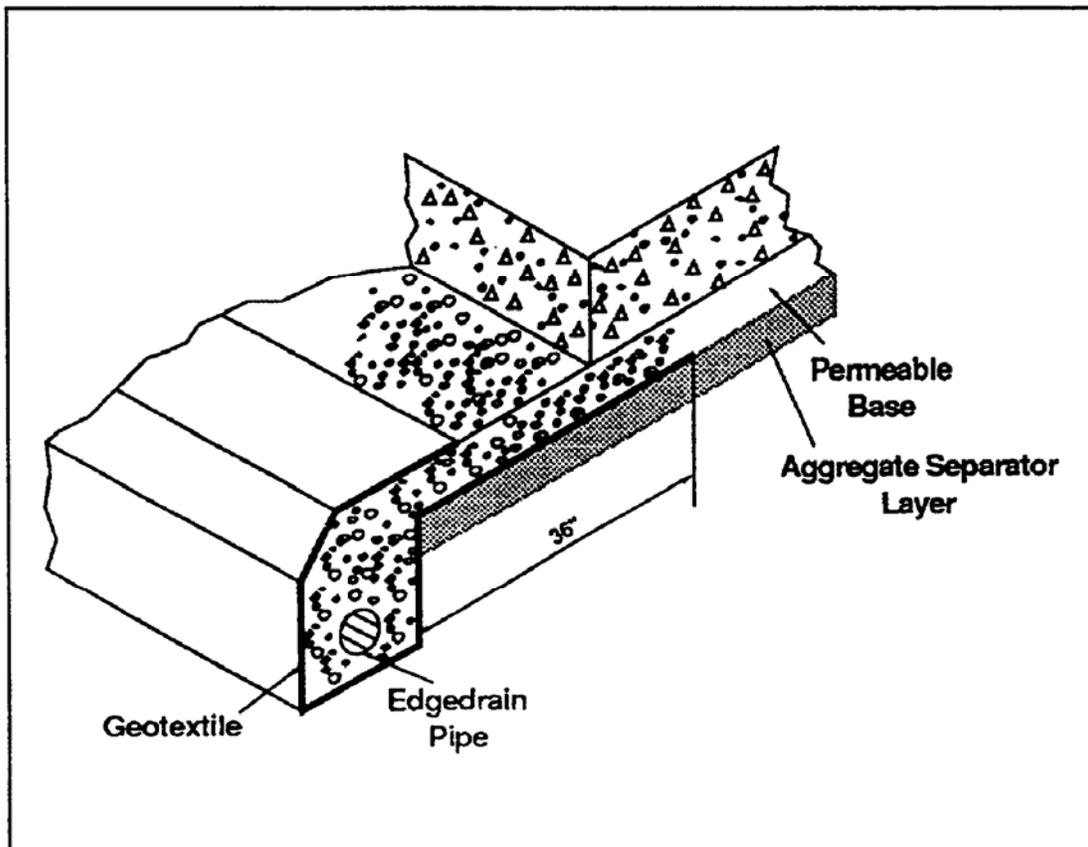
Typical pavement drainage system (FHWA, 1992)
